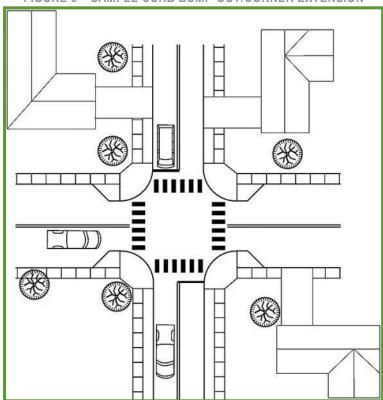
SAMPLE CURB BUMP-OUT/CORNER EXTENSION
